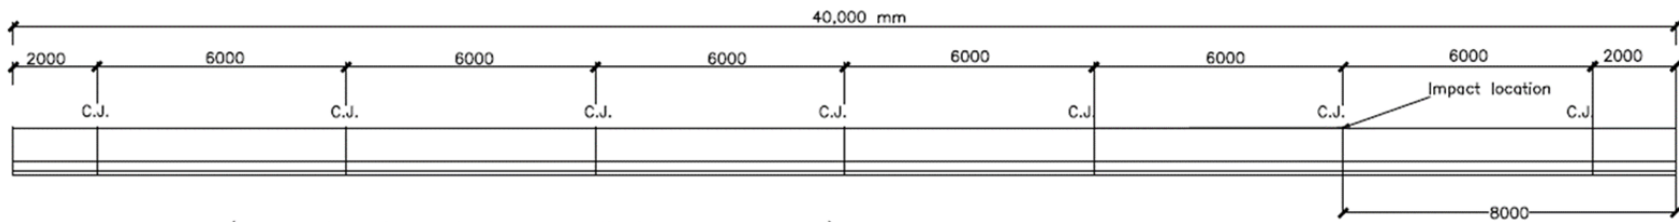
Elevation of the constructed barrier dimensioning and locations of the control joints (C.J.)
